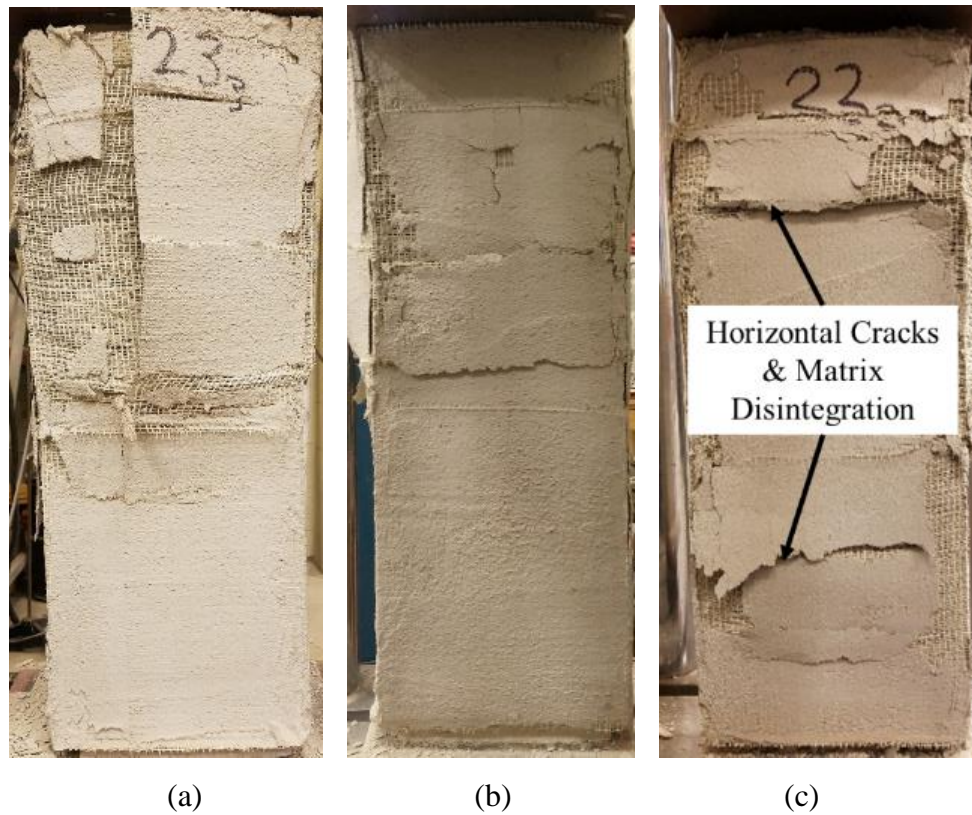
Column C-12-0-3-4 Failure Mode (a) Third (Outer) Layer Fiber Debonding, (b) Jacket Detachment, (c) Horizontal Cracking and Bulging
